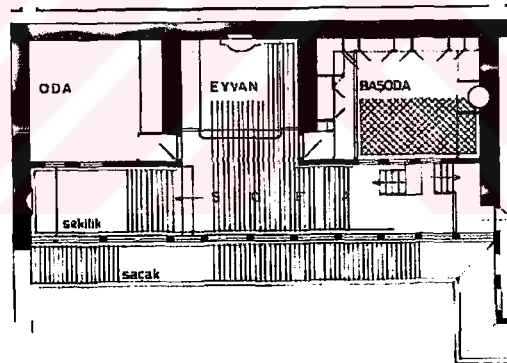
The top floor plan of the Malike house. Source: Eldem (1984a).
